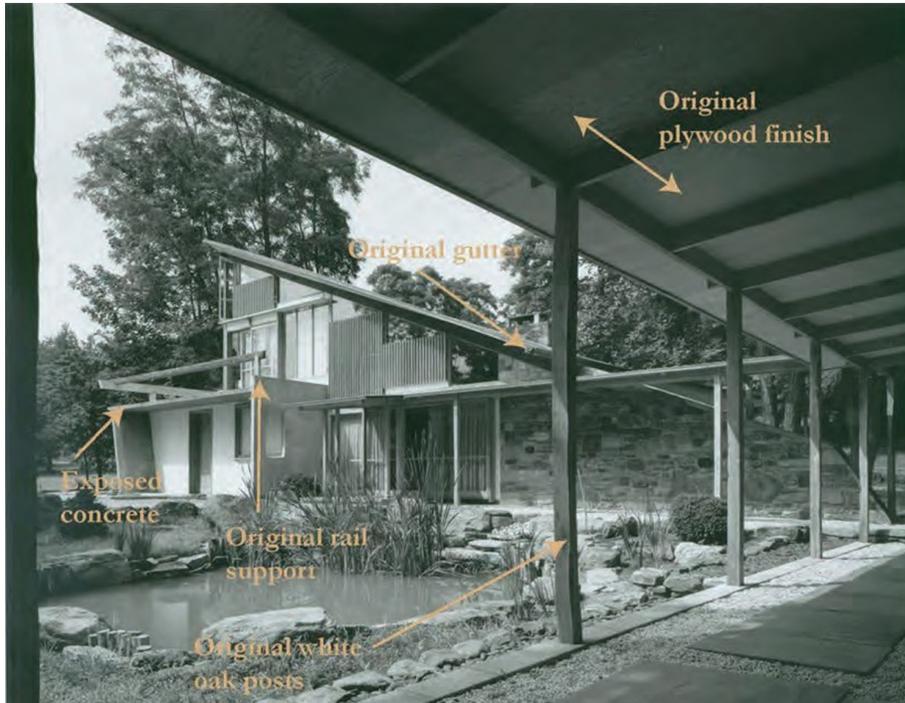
South elevation view. Date: 1965. Note the original black locust posts, plywood soffit finish, rail support, and gutter. Source: George Nakashima Woodworker Archives.
